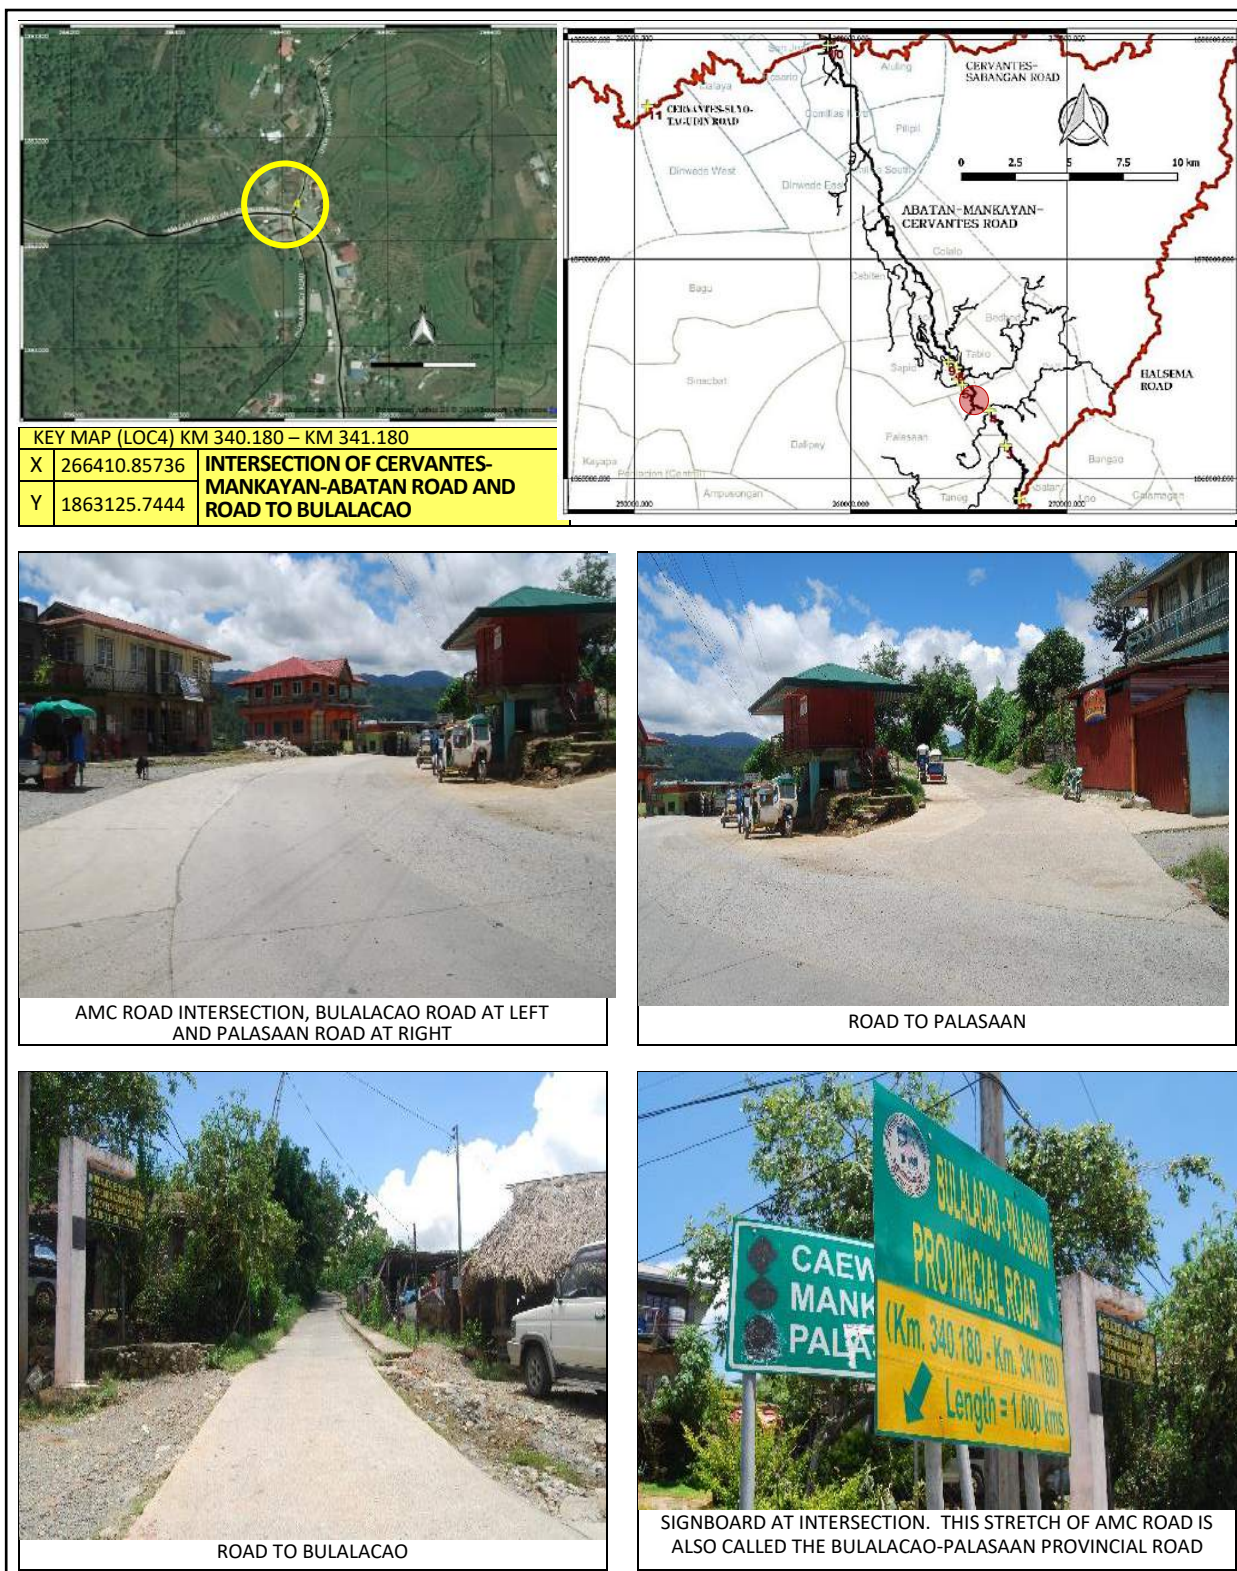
Photo Collection 3: Intersection of AMC Road and Road to Bulalacao
